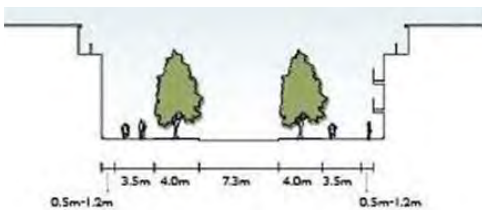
Newhall Street Section (Source: CABE, 2011)
